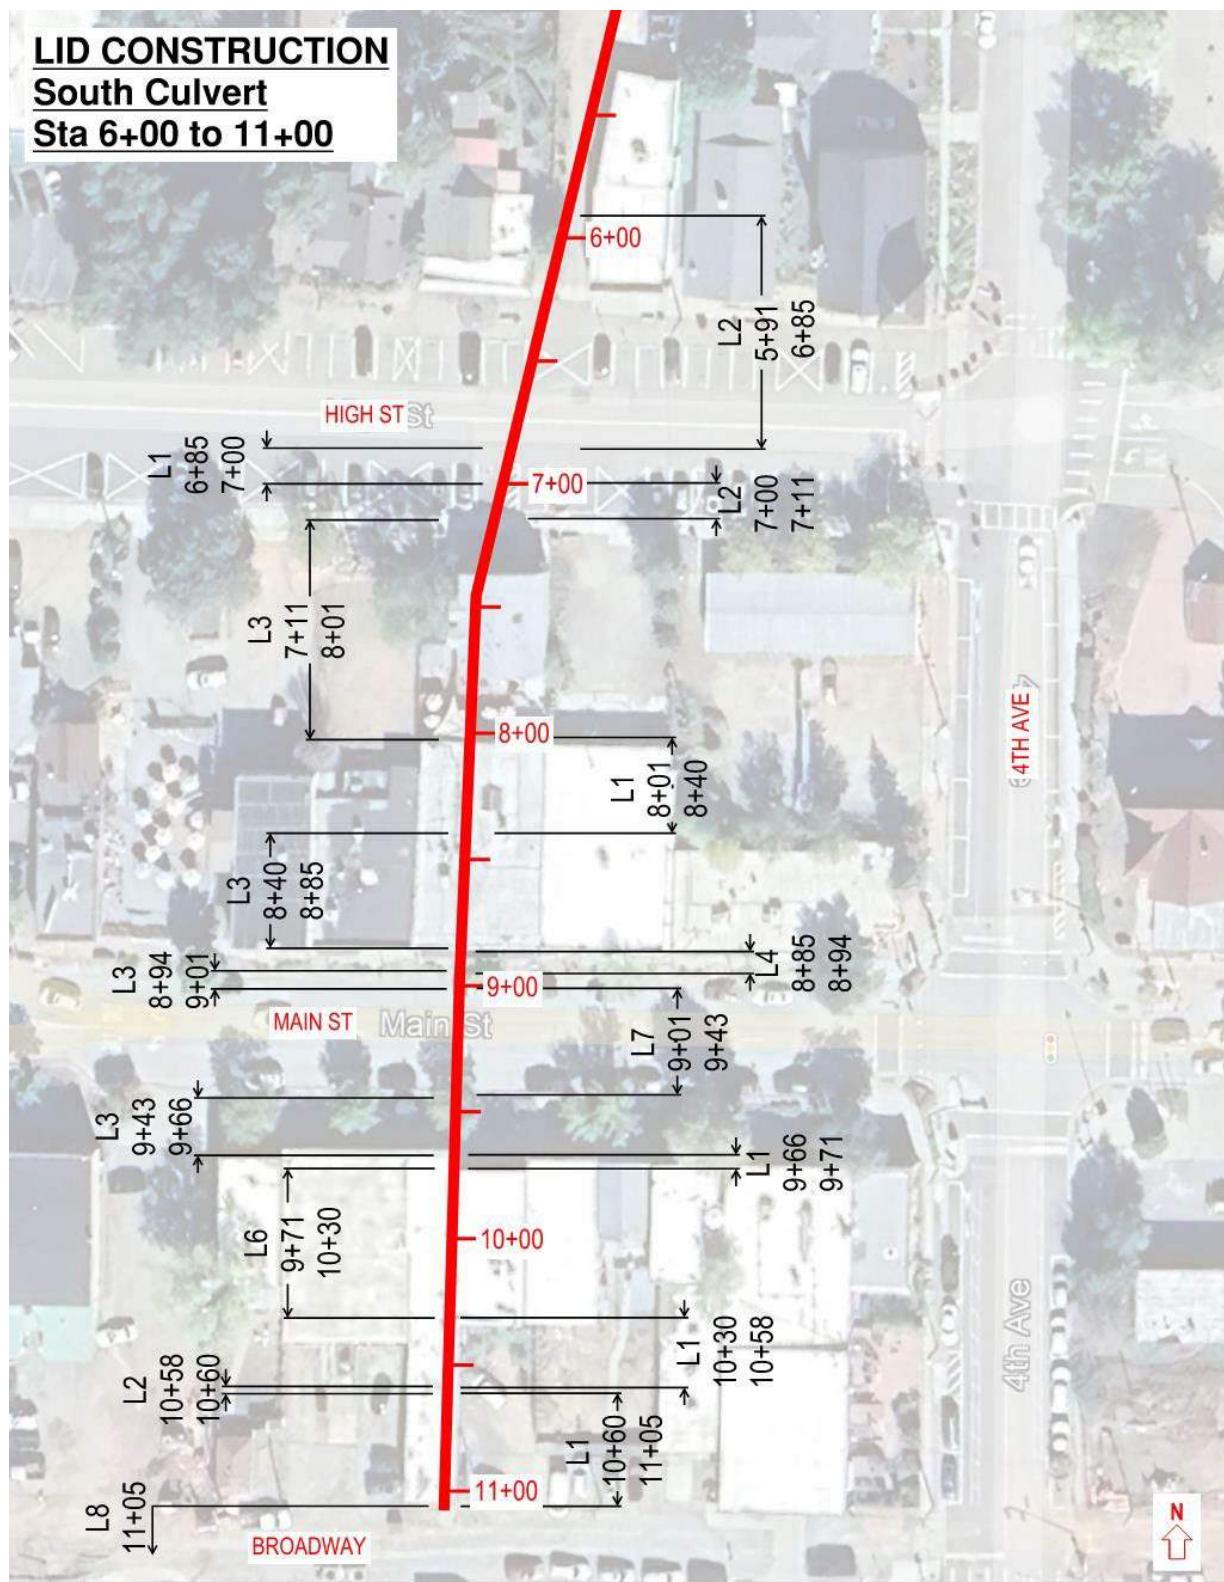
South Culvert Lid Construction Stations (S)6+00 to (S)11+00
